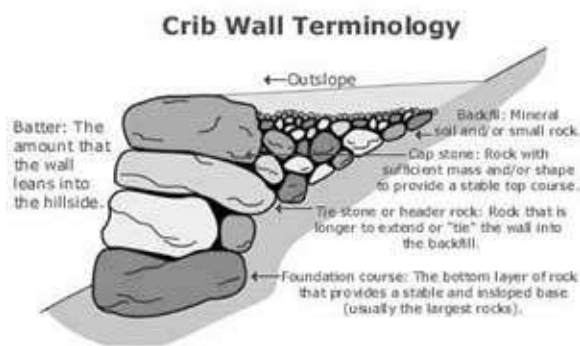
Crib Wall. Source: Hesselbarth, W., Vachowski, B., and Davies, M.A. (2004). [Trail Construction and Maintenance Notebook](#). USDA Forest Service and Federal Highway Administration.
